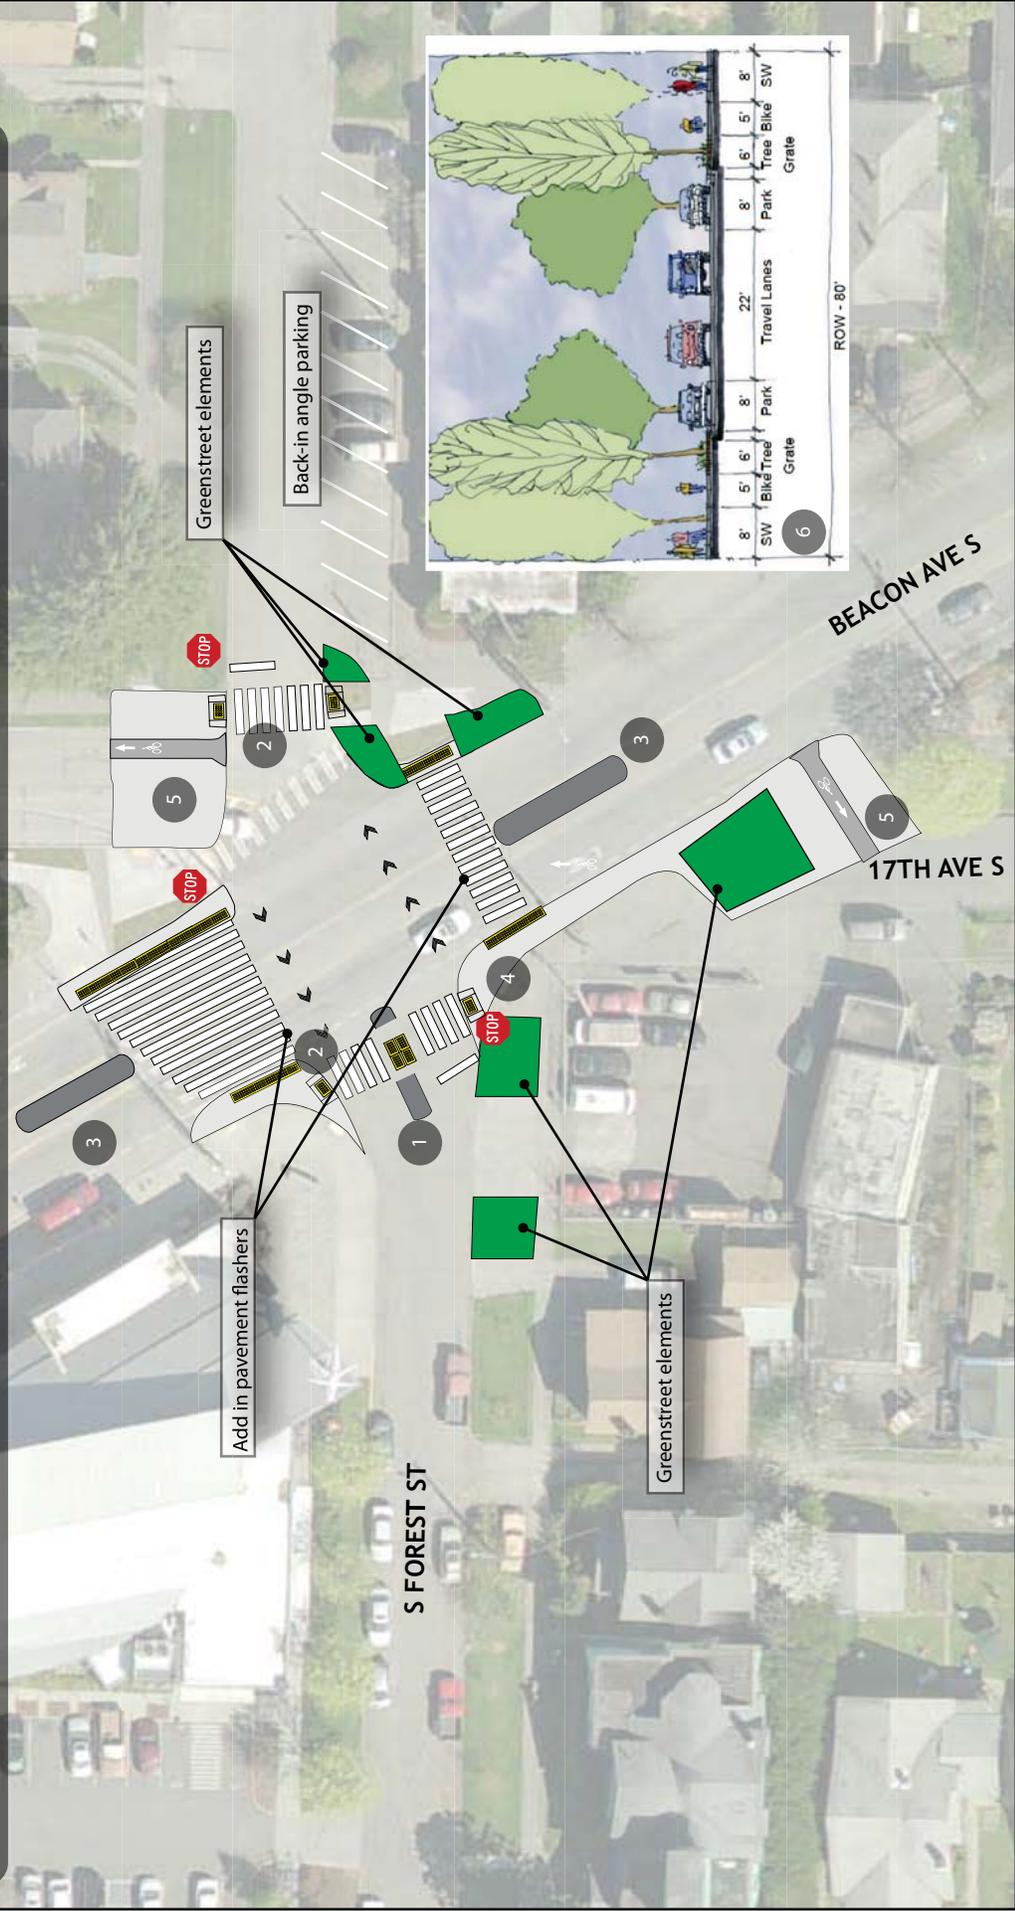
South Forest Street, Beacon Avenue South, and 17th Avenue South Conceptual Improvements
